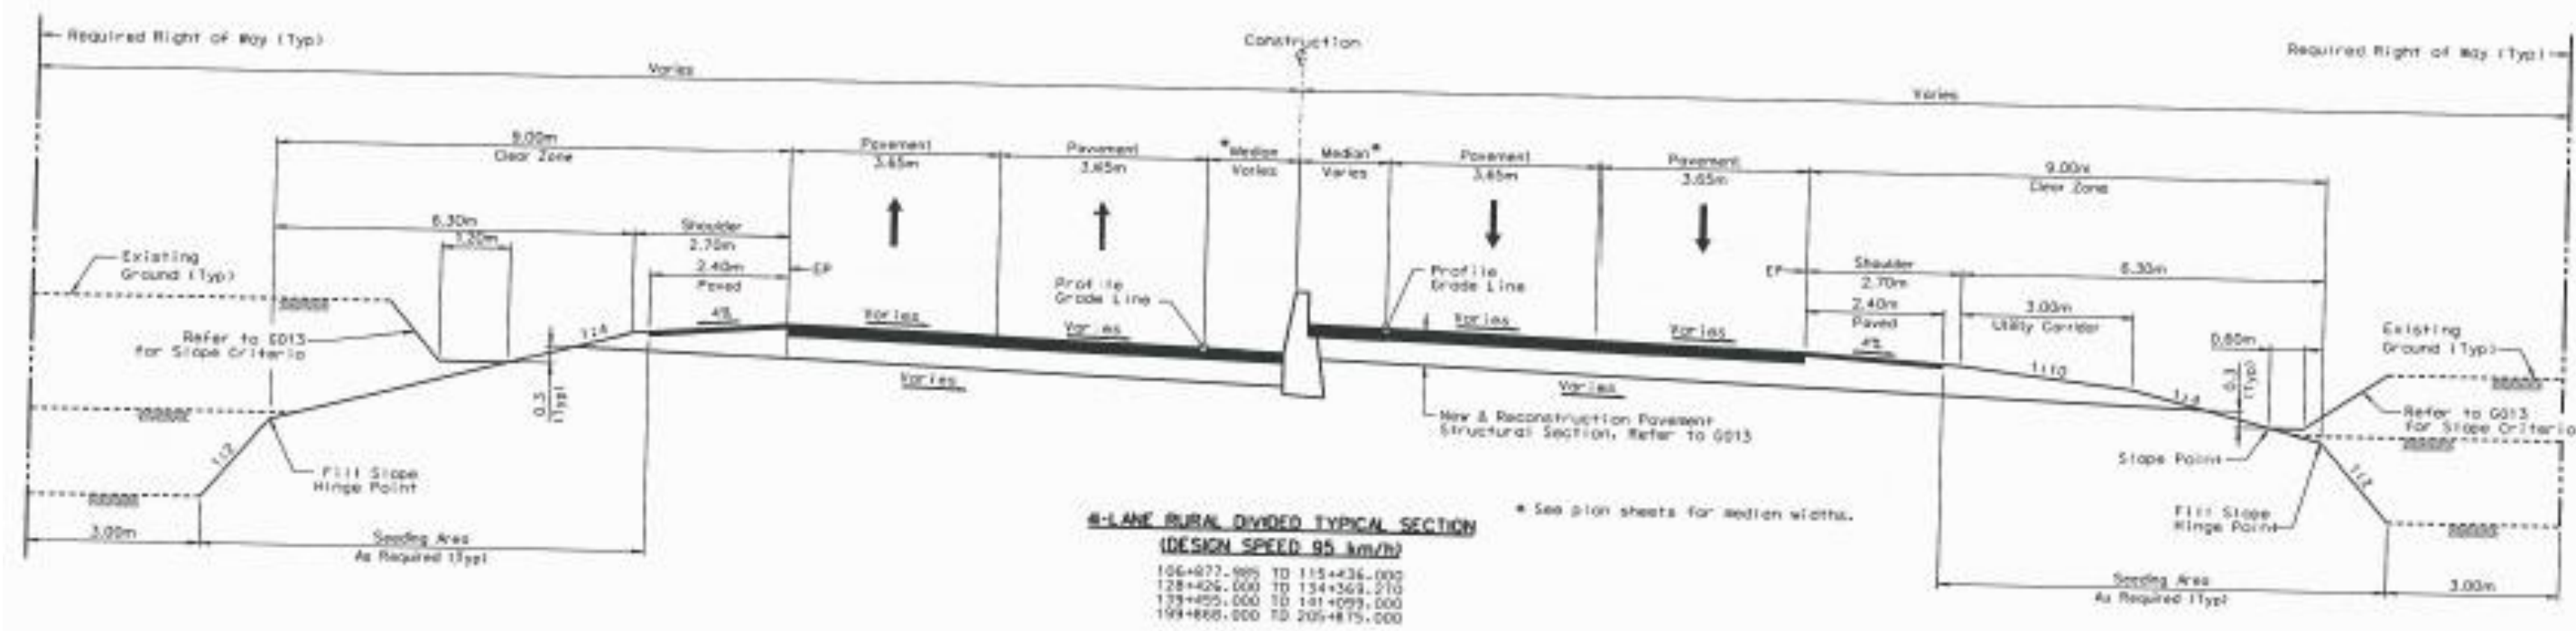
Typical road section between chainage 106+877 and 115+436, with design speed 95 km/h
